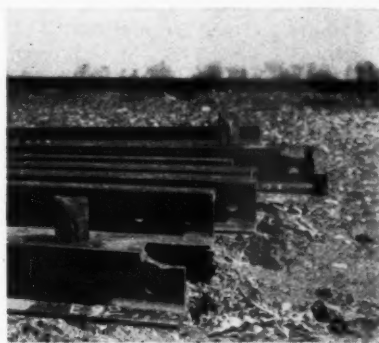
A Head Failure at the End of a Rail, Showing Piece Broken Out
